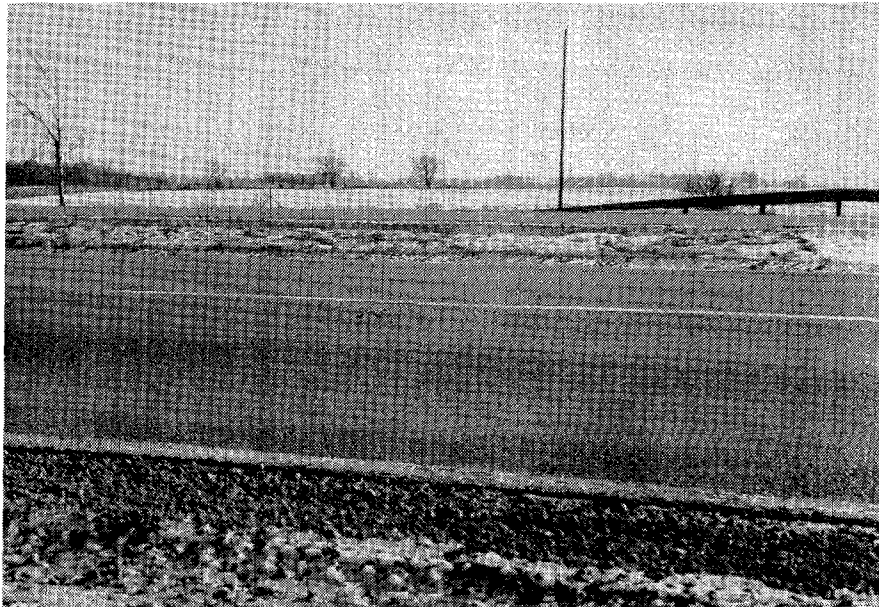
Illustration of rutting of flexible pavement (FLEX-8, Illinois).
